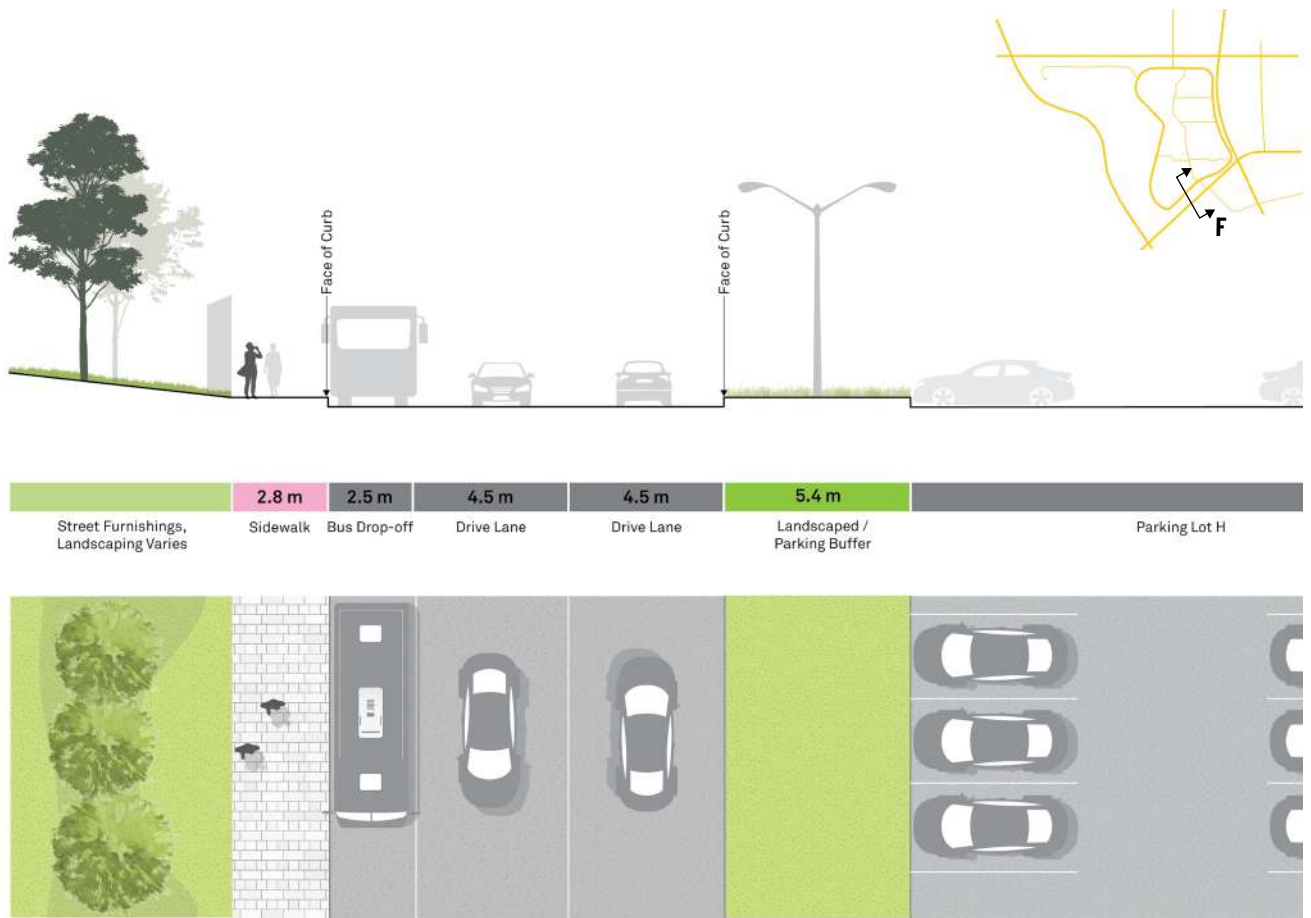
Section F. Existing condition of Ring Road (southern edge).
